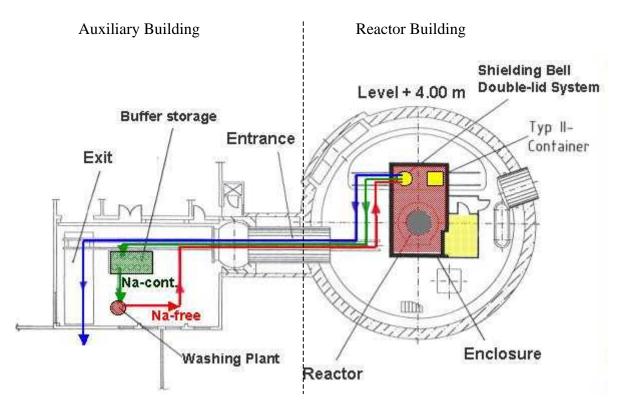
Floor plan containing enclosure, buffer store, and washing plant
